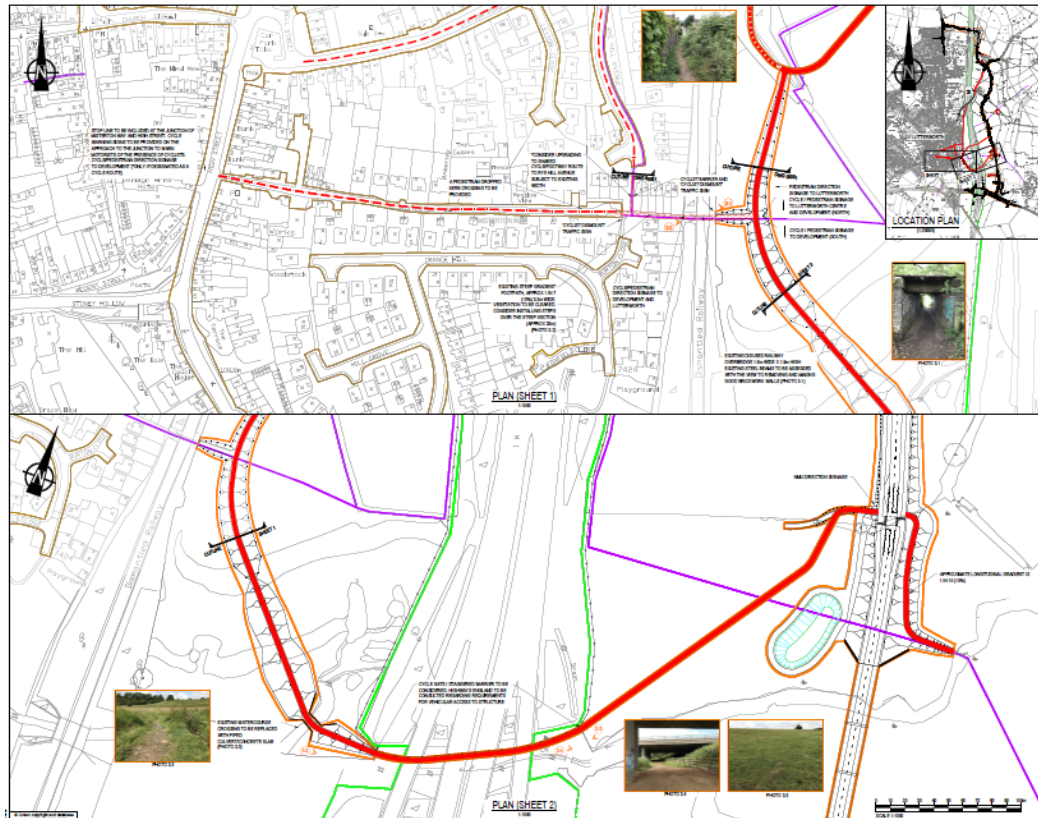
Non-Motorised user plan indicating proposed underpass crossing and Misterton Way link
